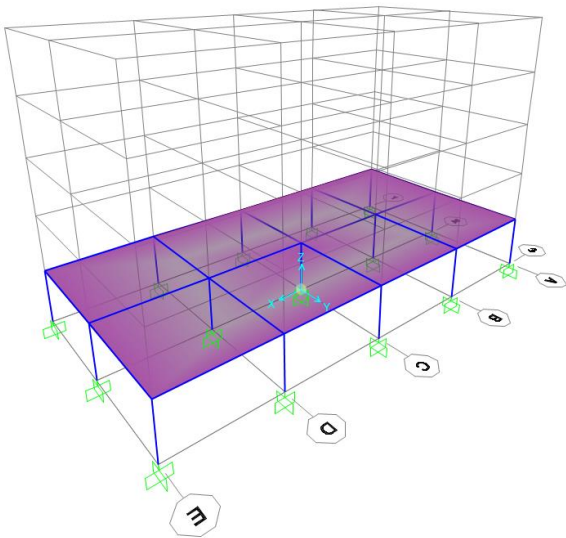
Example of area defined for the application of distributed loads to be transmitted into the reinforced concrete frame
